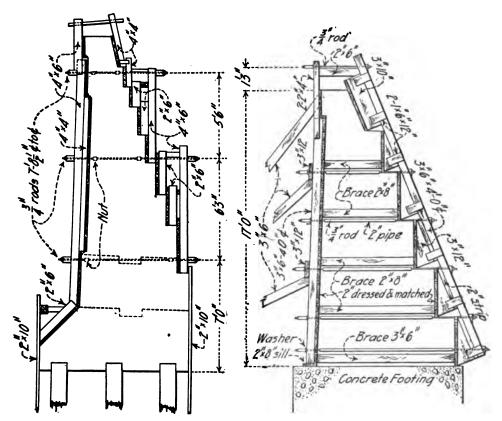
Forms for Illinois Central R. R. Retaining Wall.
